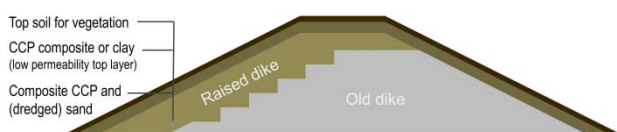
Recommended general cross-section of a raised renovated dike using CCPs
